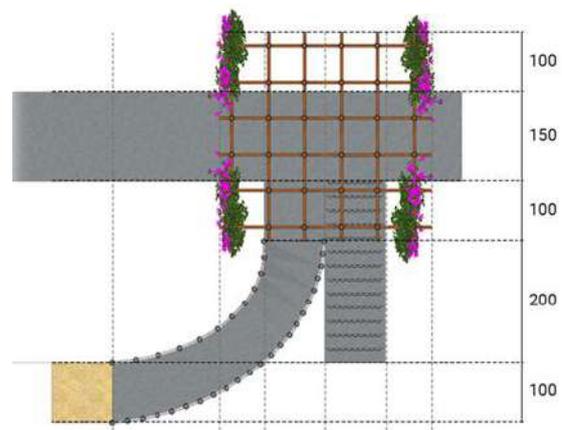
The ground plan of the pergola/shelter and sliding surface
